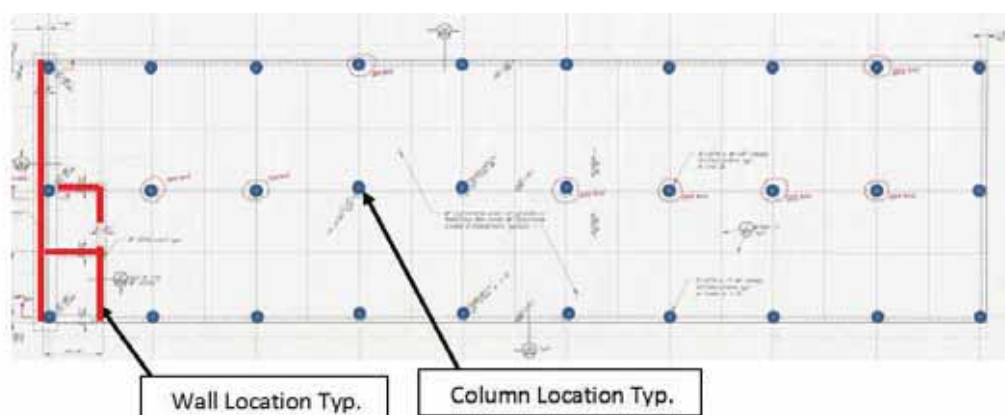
Covered Storage Building Column and Masonry Wall Locations
